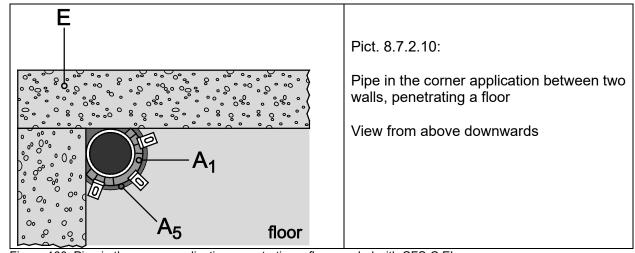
Pipe in the corner application, penetrating a floor, sealed with CFS-C EL
